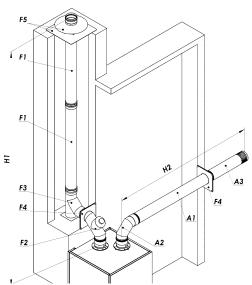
Connection to the existing flue gas outlet duct
